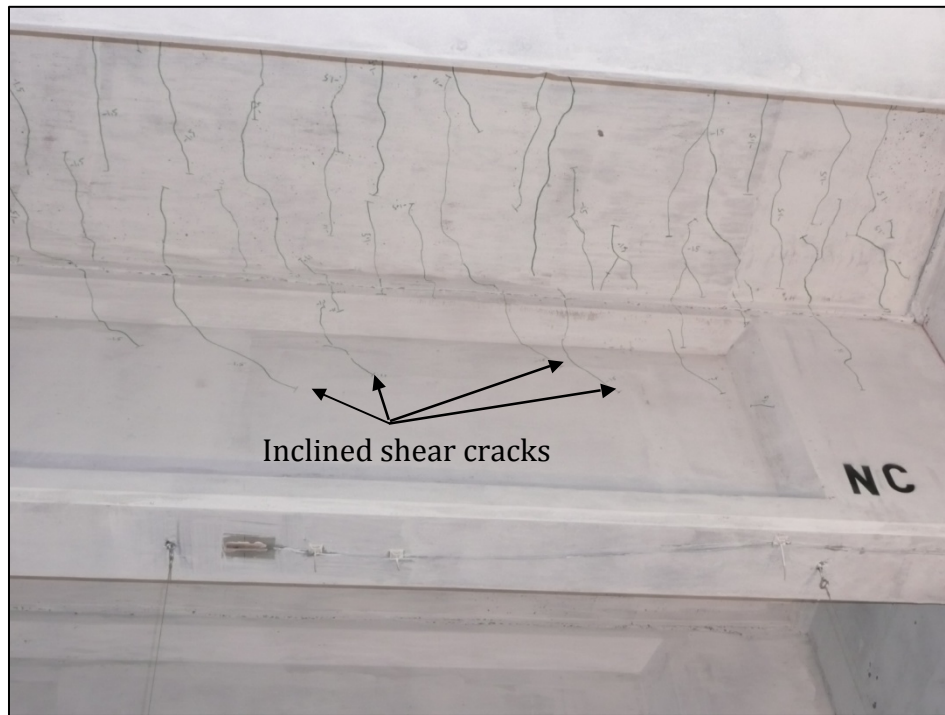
Inclined Shear Cracking Observed on the Center Girder on the Improved Connection Side at -1.5 in. Vertical Displacement
